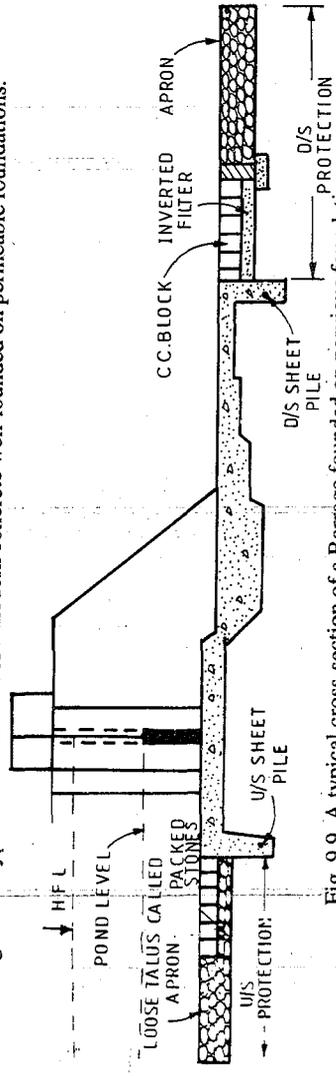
A typical cross-section of a Barrage founded on pervious foundations.
